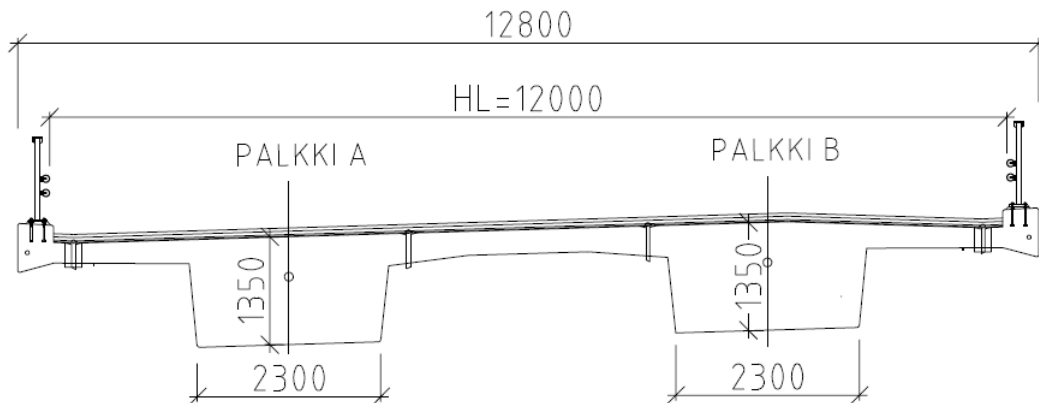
Mid-span cross section of the Särkijärvi Bridge construction plan.
